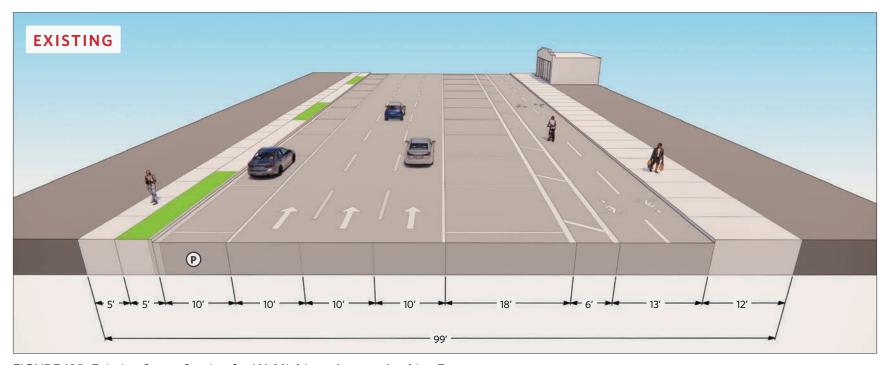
Existing Street Section for W. Michigan Avenue, Looking East
